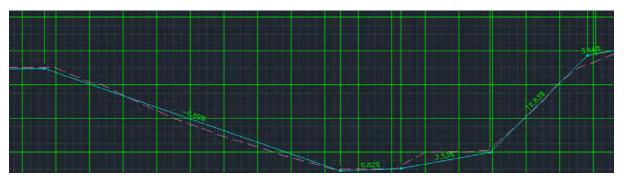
Simcoe Street Bypass – Vertical Profile at Proposed Greenbelt Crossing Location
